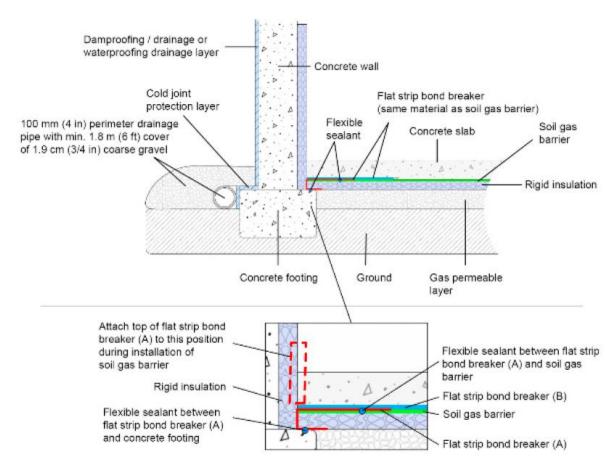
Installation of soil gas barrier on concrete foundation (with insulation)
